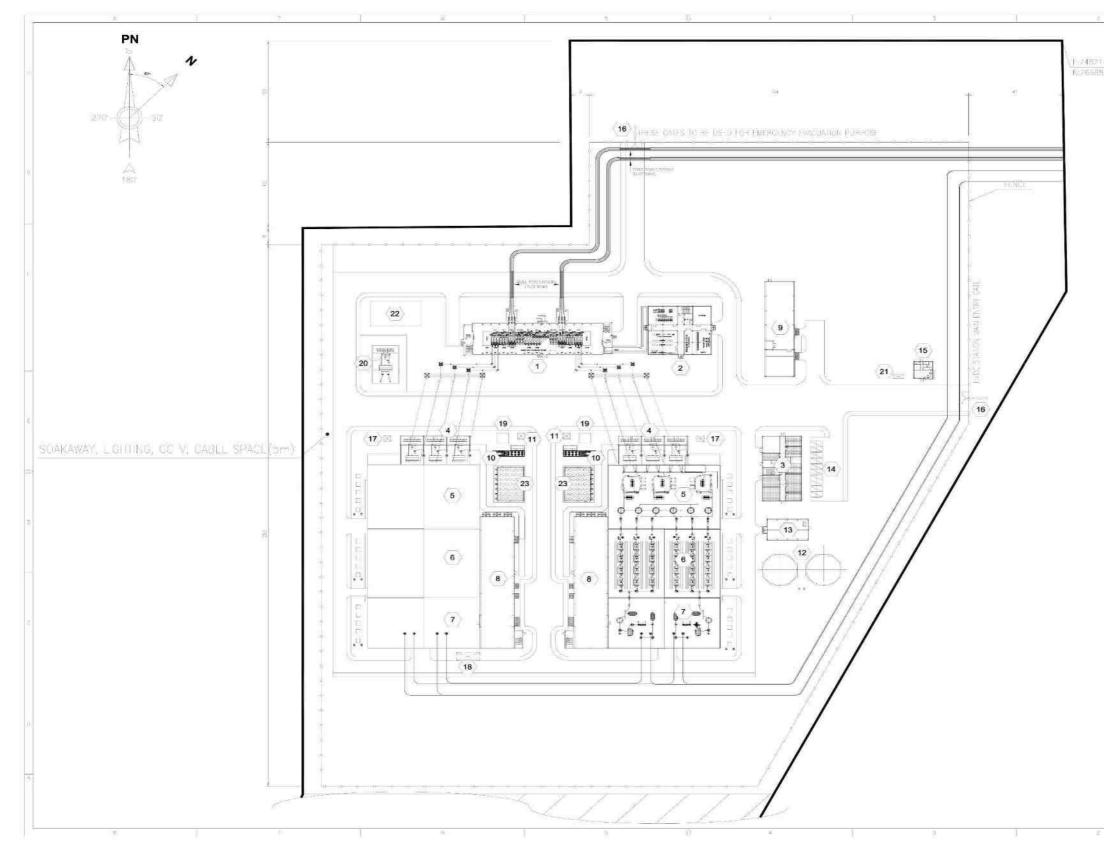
Proposed onshore elements layout at Mirfa (Route 1)
